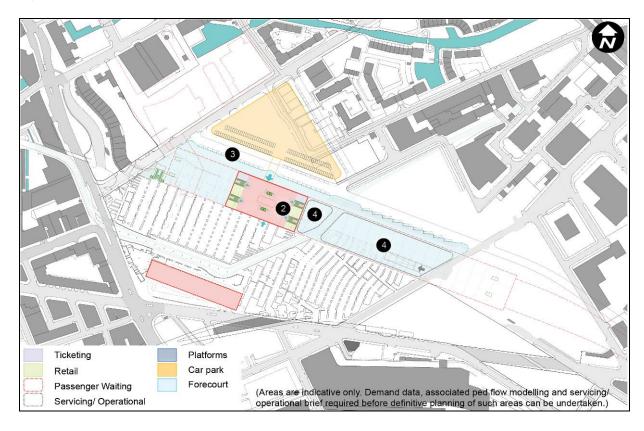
Option 1a – Proposed Concourse Level Plan
